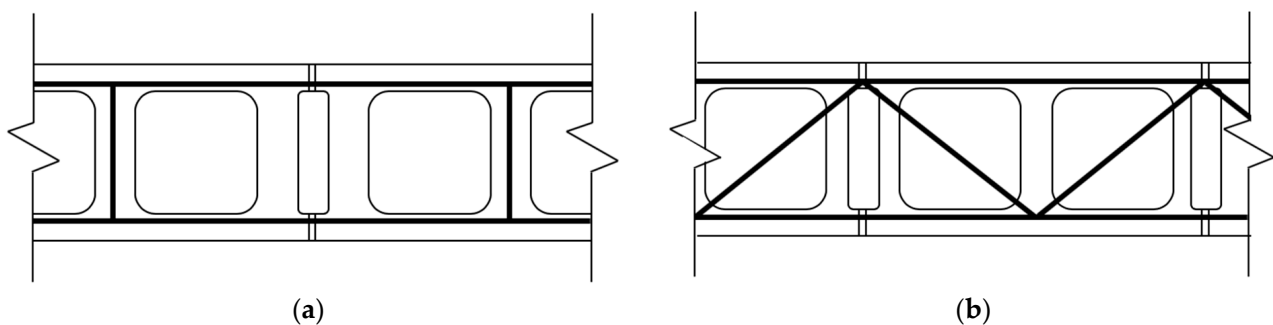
Two types of joint reinforcement in masonry walls: (a) ladder-type and (b) truss-type.
